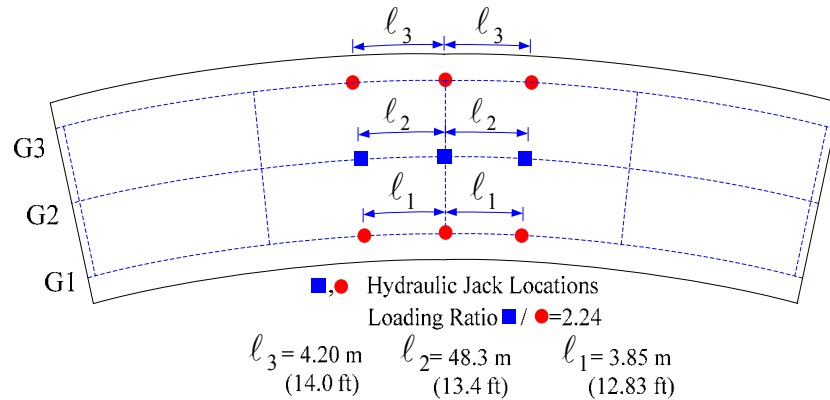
Nine hydraulic jacks positioned on both the inside and outside lanes of the test bridge slab for Tests 4a and 4b, corresponding approximately to two AASHTO design vehicles plus lane loads.
